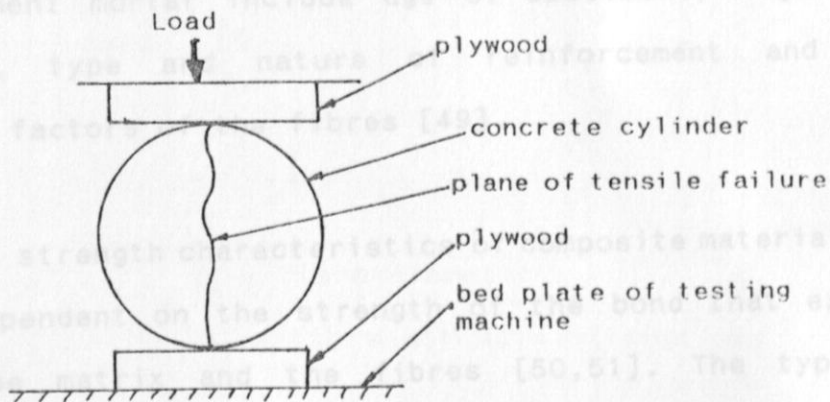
Splitting tension test arrangement for loading concrete specimens.
